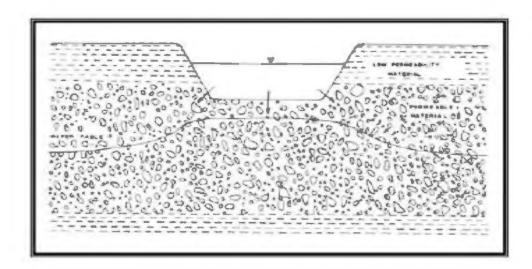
TYPICAL SECTION OF A CHECK DAM/GULLEY PLUGS
